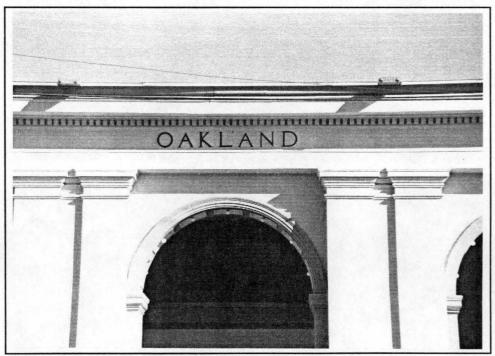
Detail of flat parapet, dentils, fascia, pilaster capitals, and arch
